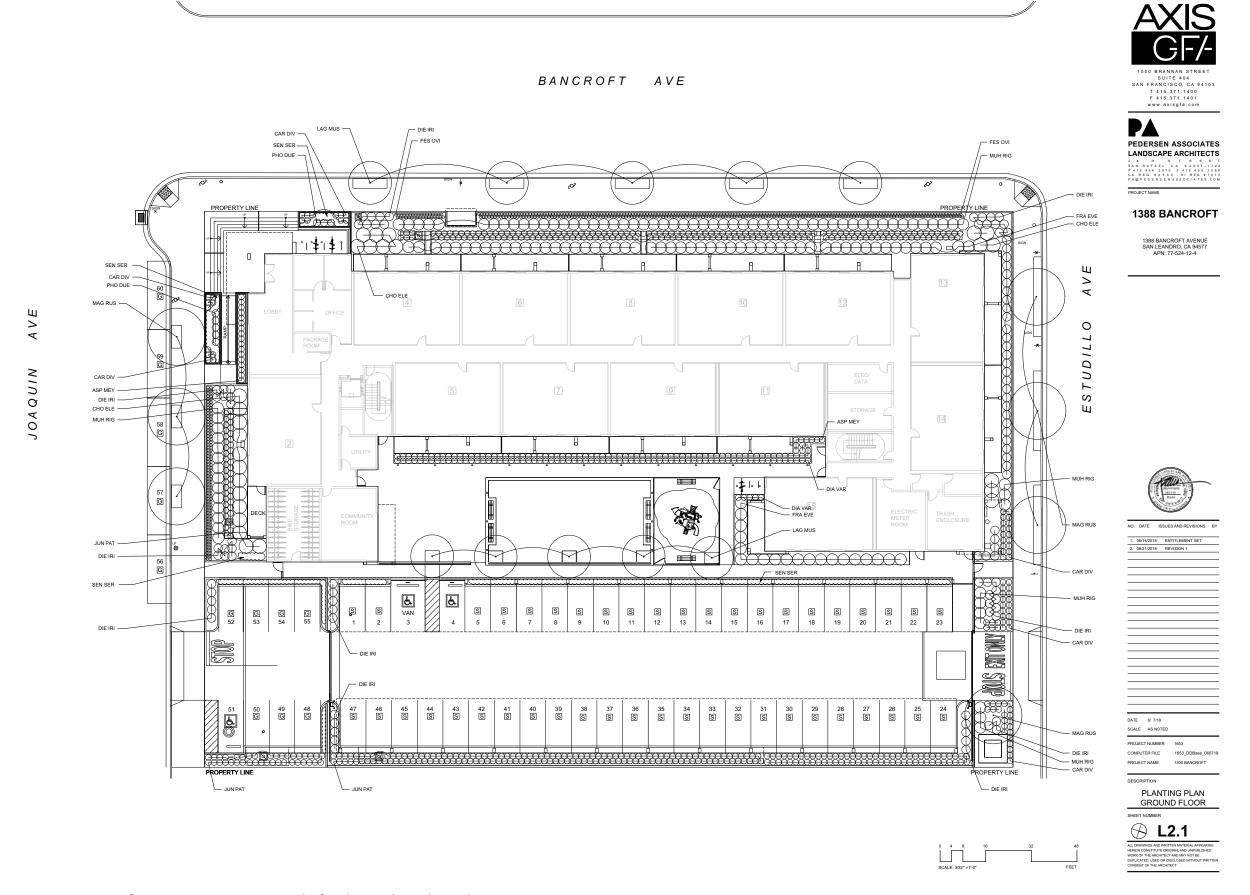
# EXHIBIT R - PLANTING PLAN - GROUND FLOOR
